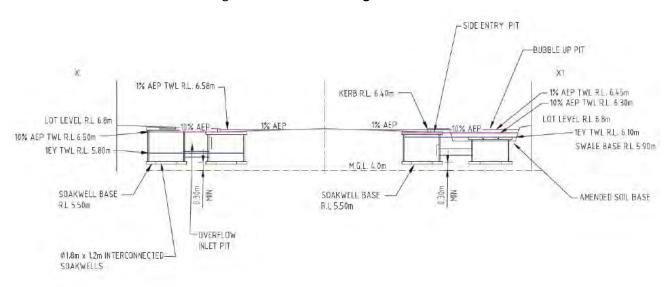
Cross section of road reserve showing typical bioretention garden concept in plan view
